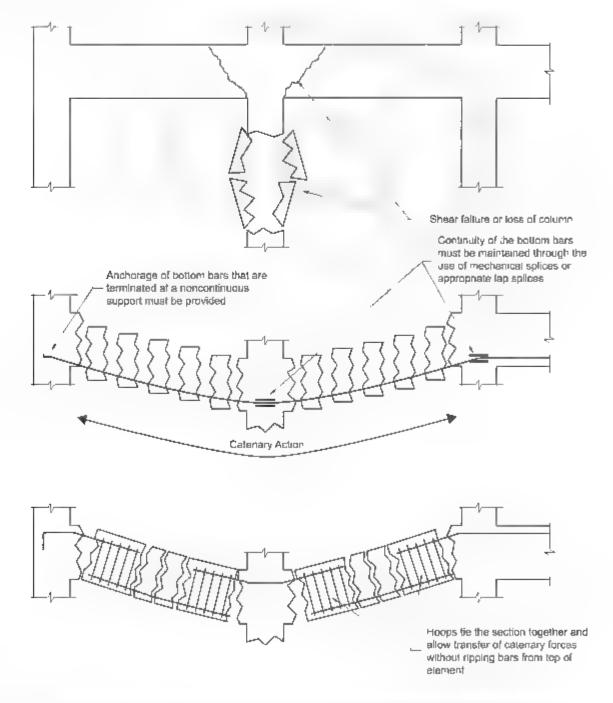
Role of integrity reinforcement in maintaining overall structural stability following loss of support
